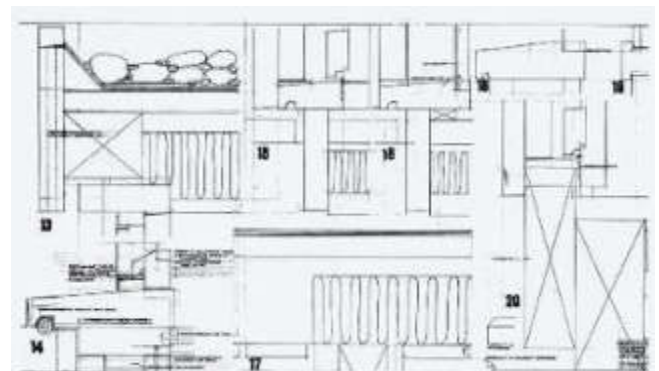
Guesthouse constructive details, drawing by Vilhelm Wohlert. PARDEY, J., (2007). Louisiana and Beyond: The Work of Vilhelm Wohlert. Hellerup (Denmark). Blondal. p.27..
